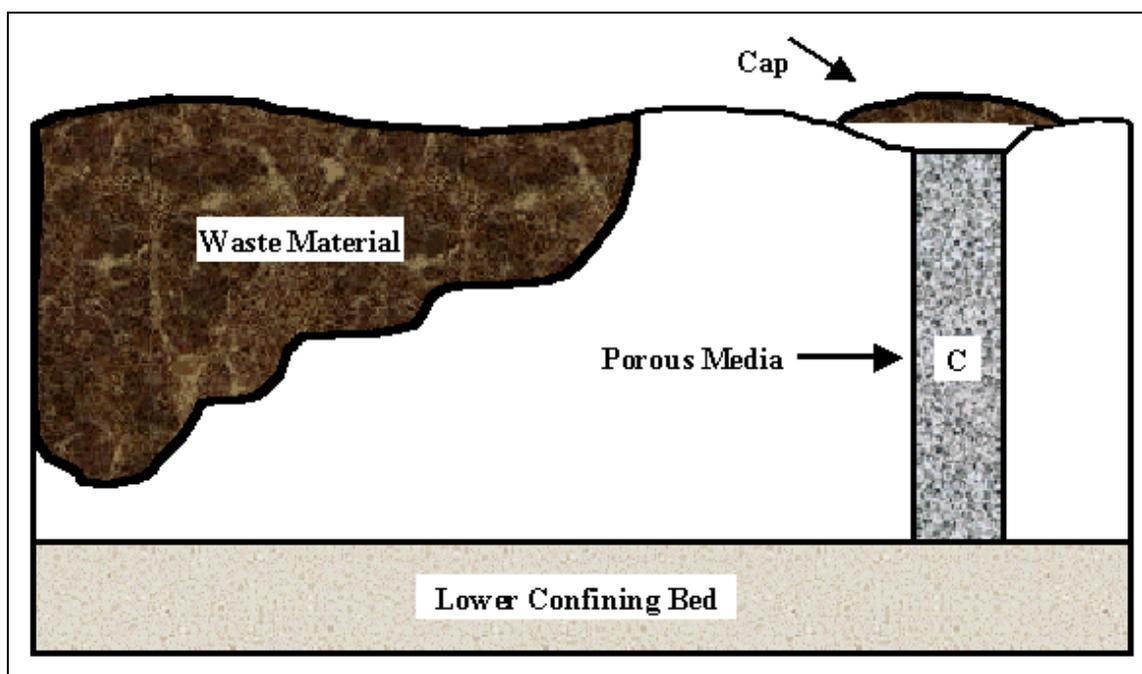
Typical Permeable Treatment Wall (Cross-Section) (AEC 2002b).
